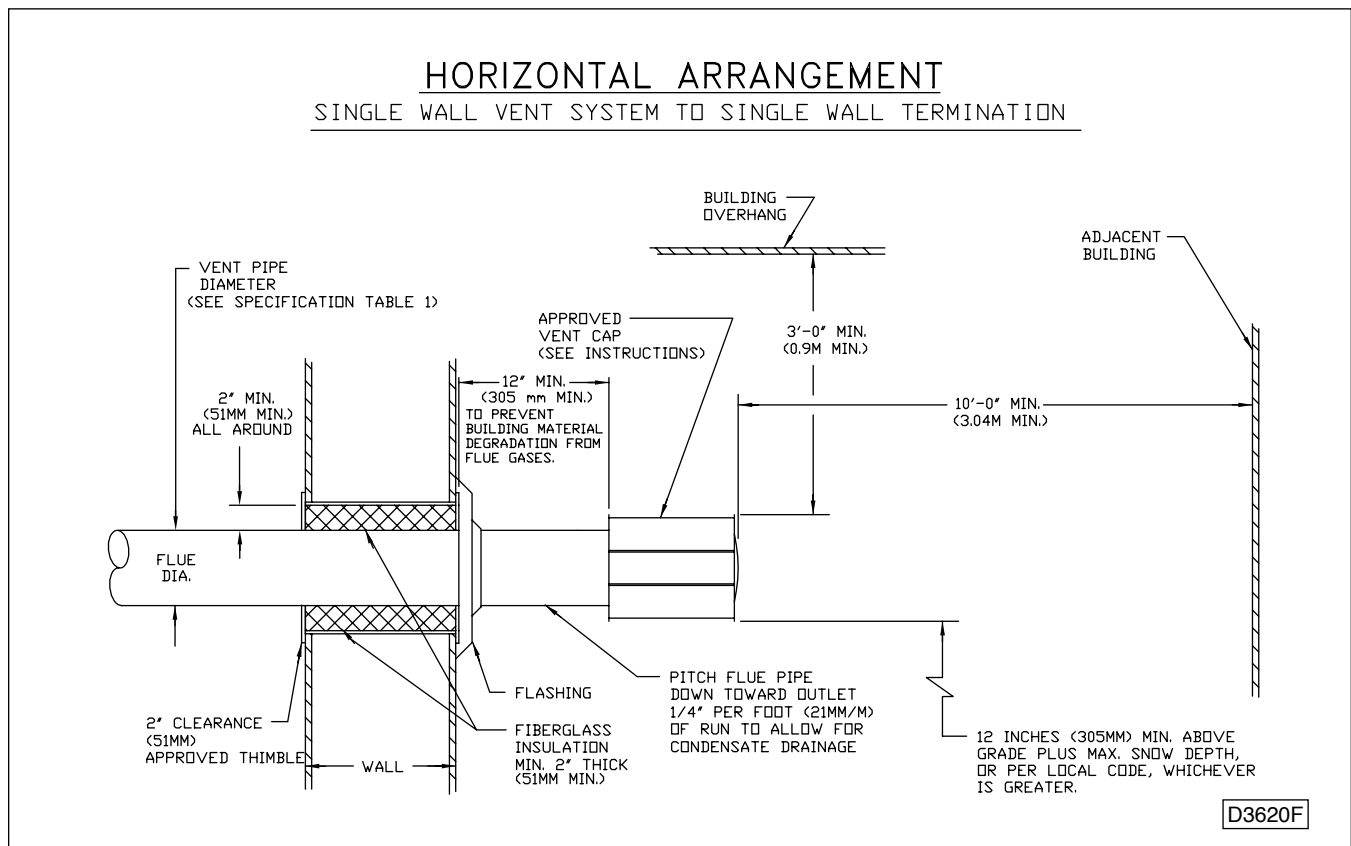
B - Horizontal Arrangement, Single Wall Vent System to Single Wall Termination
